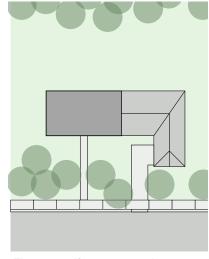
If a garage projects beyond the front façade, the entry should be located on the return and not the front elevation. (Source: ERA)
